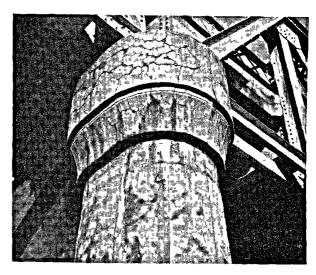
King City Bridge. Pier cap with typical map cracking.
